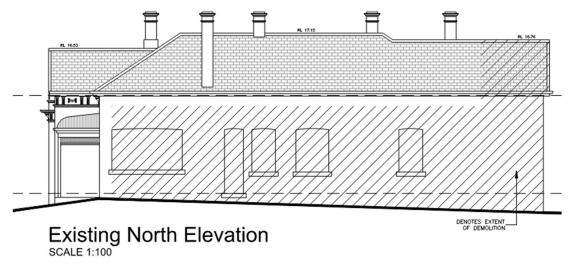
Existing northern elevation, demonstrating extent of proposed demolition in a hatched overlay.
